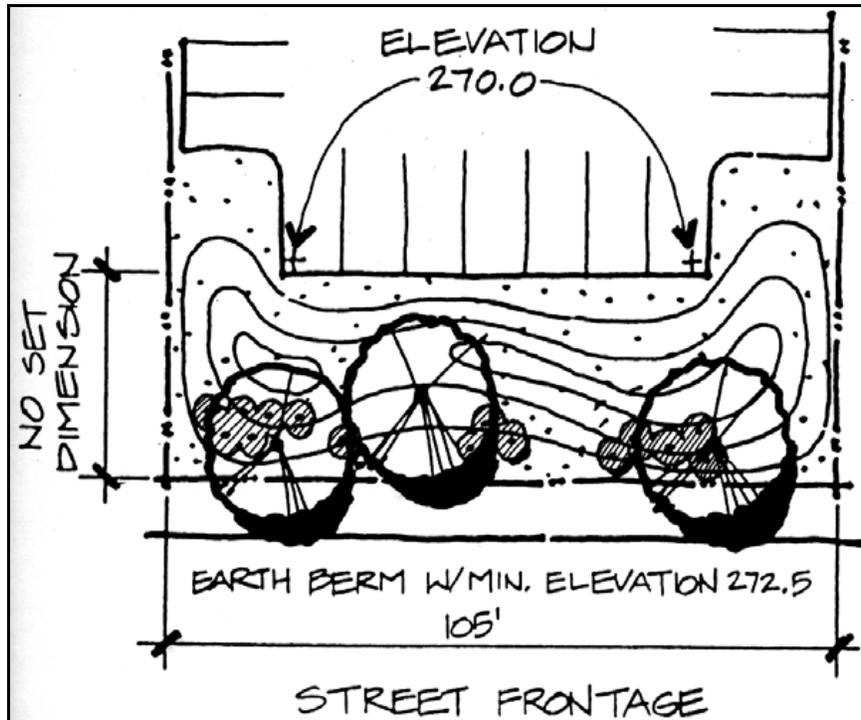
Parking Lot Landscaped Strip, Option 2
